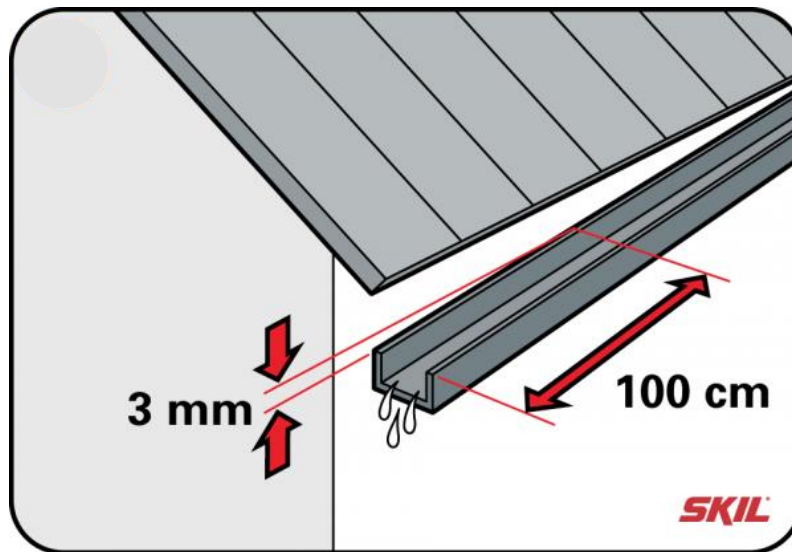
Recommended slope on eavestrough installation of 3mm vertical drop per 1m horizontal distance (image courtesy Skil.com)
